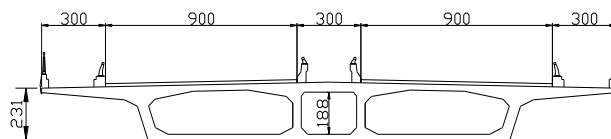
Main Bridge PC Continuous Box Girder Layout /cm
